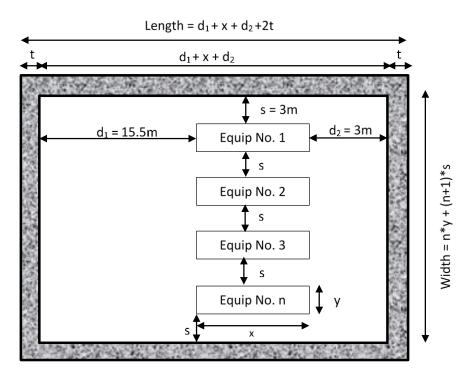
Approach used in calculating building space requirement of individual equipment in the briquetting plant
